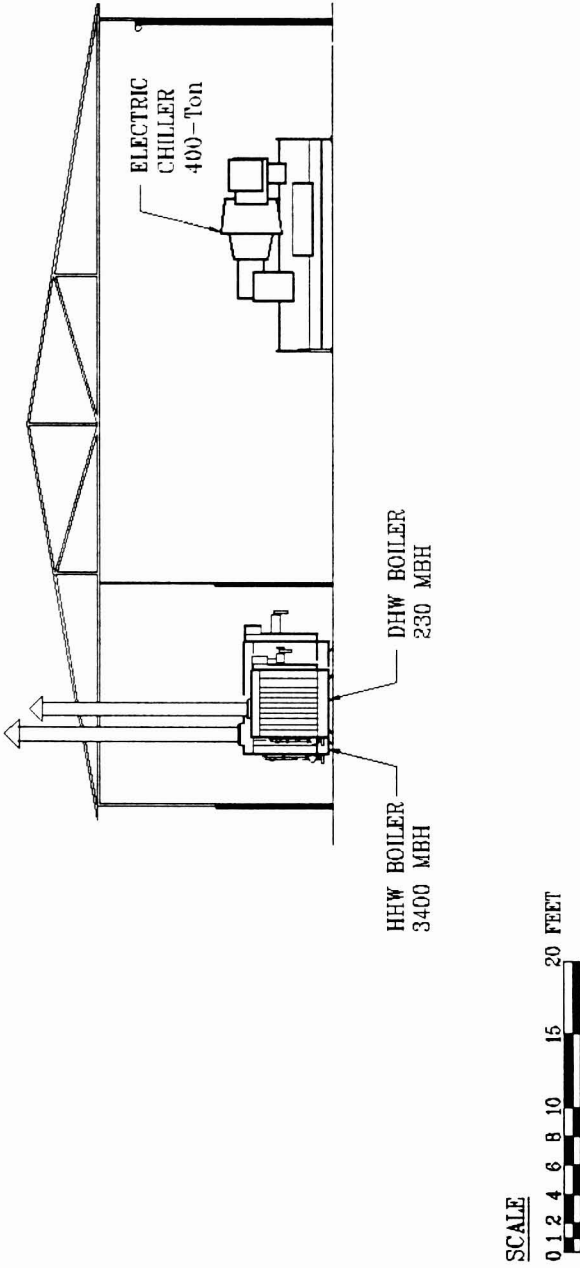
Base Plant: Electrical Centrifugal Chillers System Plant for Office Tower
